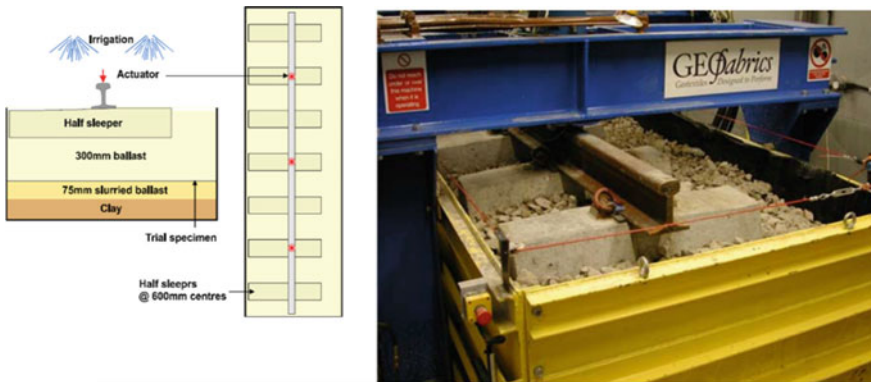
Full-scale test rig—plan dimensions 2 m wide \times 6 m long
